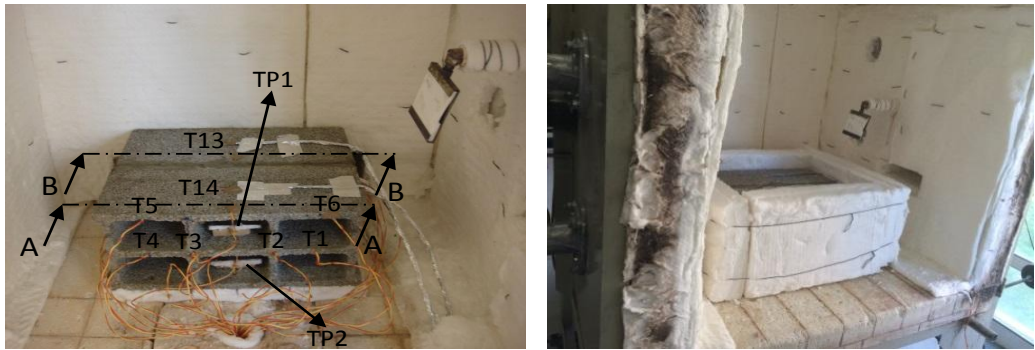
CMU-PCC masonry wall sample. Left: Thermocouple application, Right: Lateral fire protection
